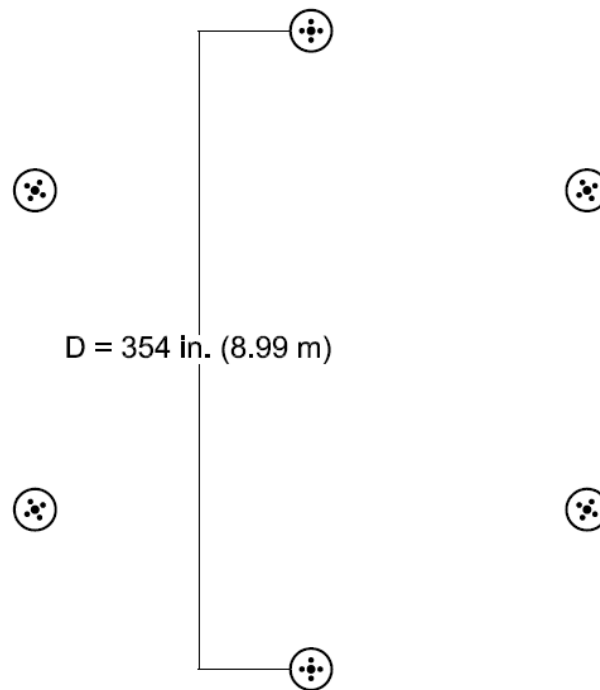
Cross Section of the UHPC Lattice Tower at the Base
